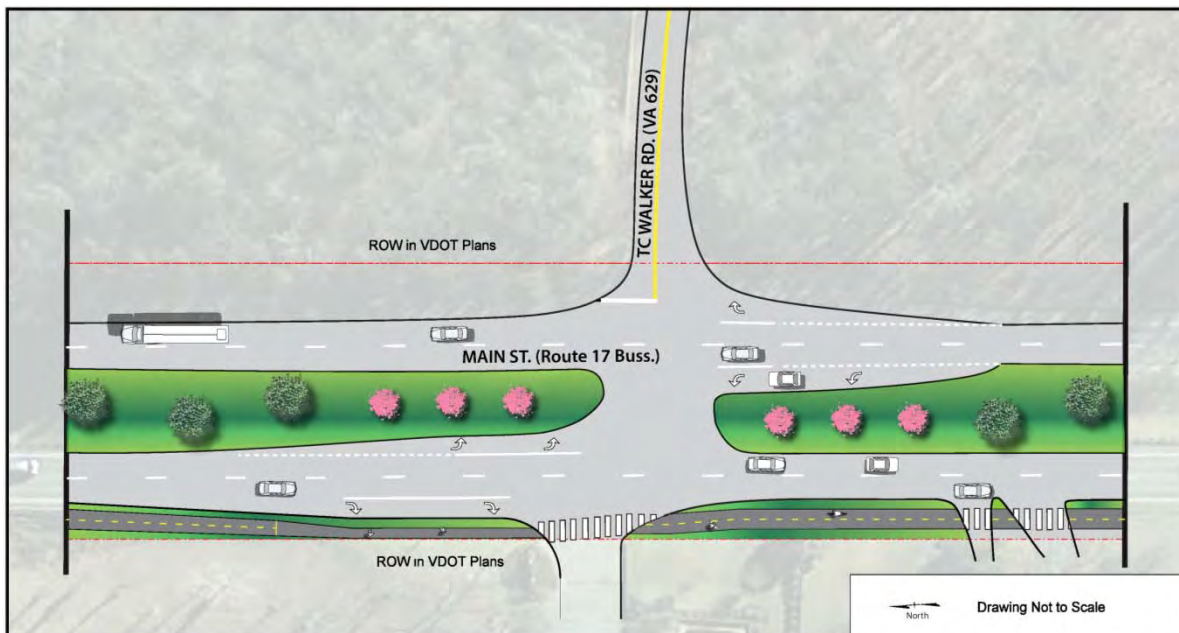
Plan view of recommended improvements at Main Street/TC Walker Road (VA 629)
